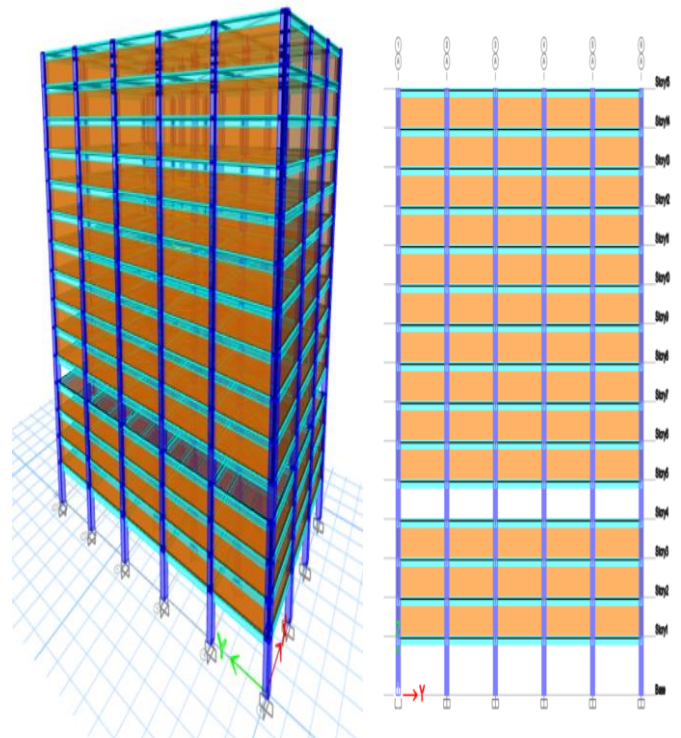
3D and Elevation view of Model, 5th floor open and rest all filled with infill walls
